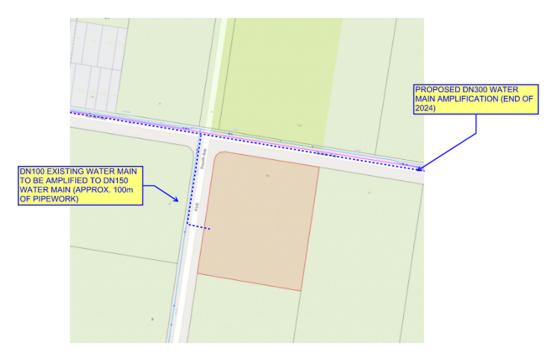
Arrangement of available Potable Water and Recycled Water mains fronting Fourth Avenue and Gurner Road.
